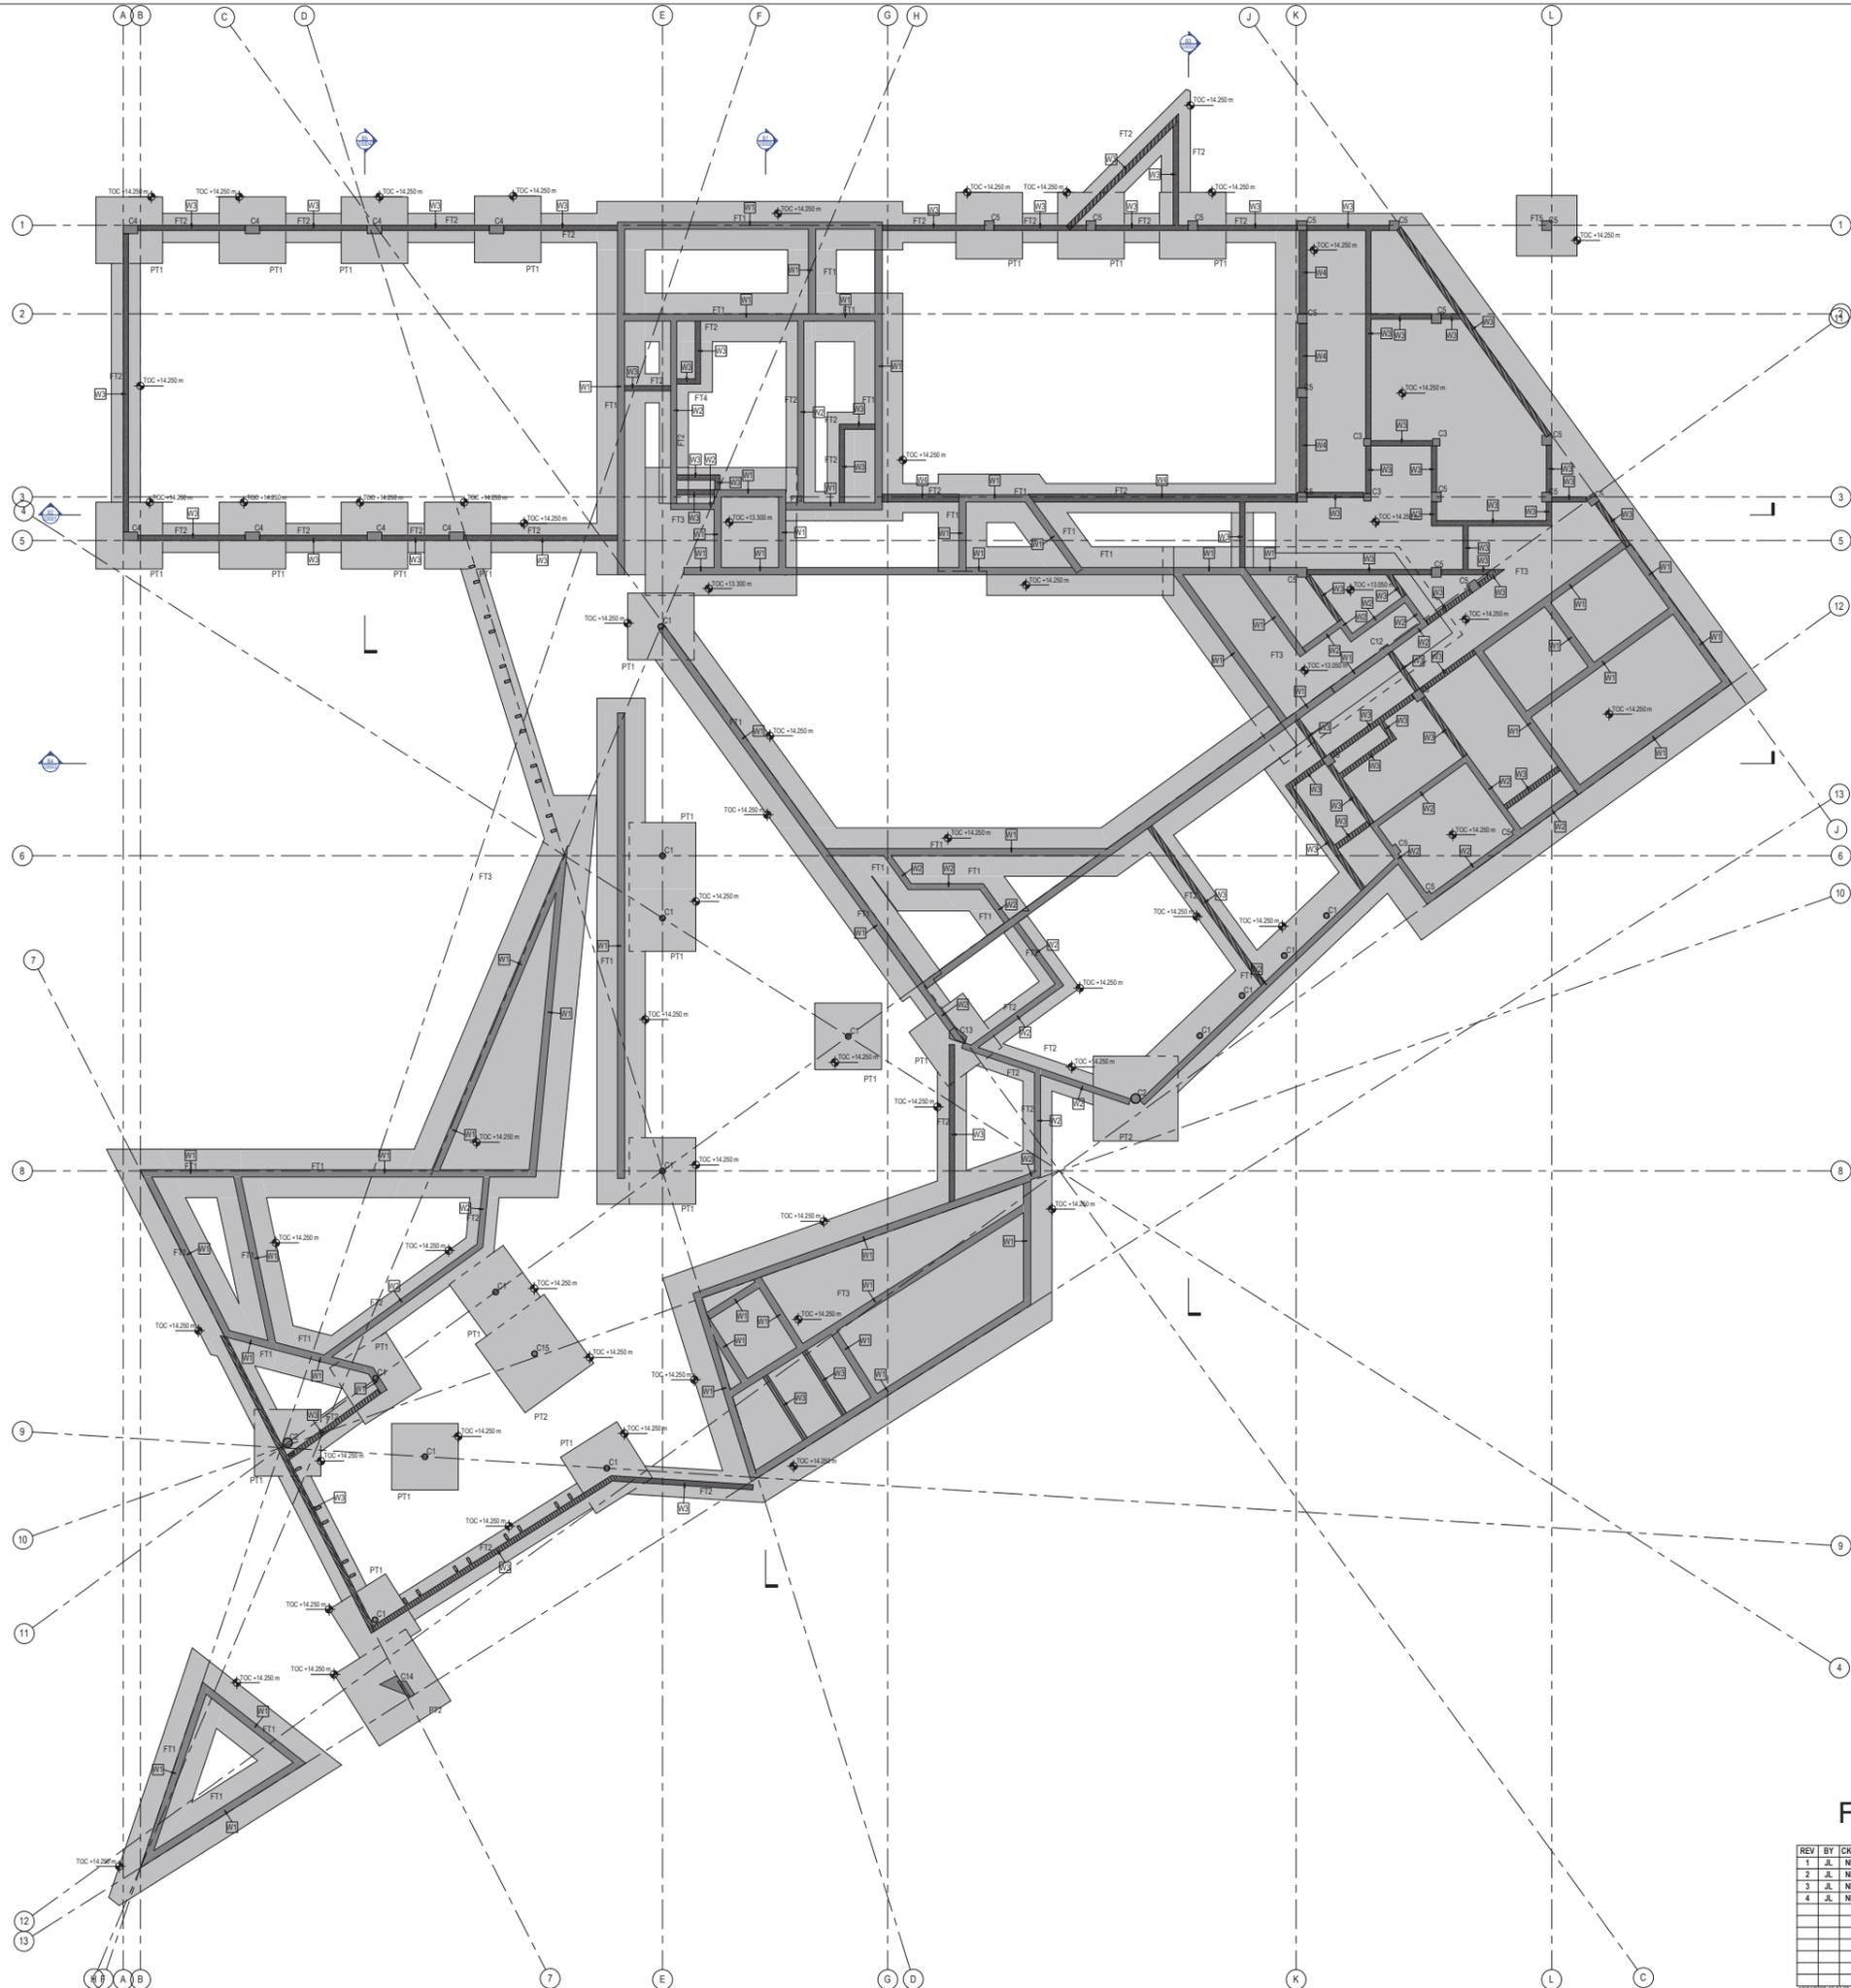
Foundation detail at ground floor (after Horgan Lynch 2022).
